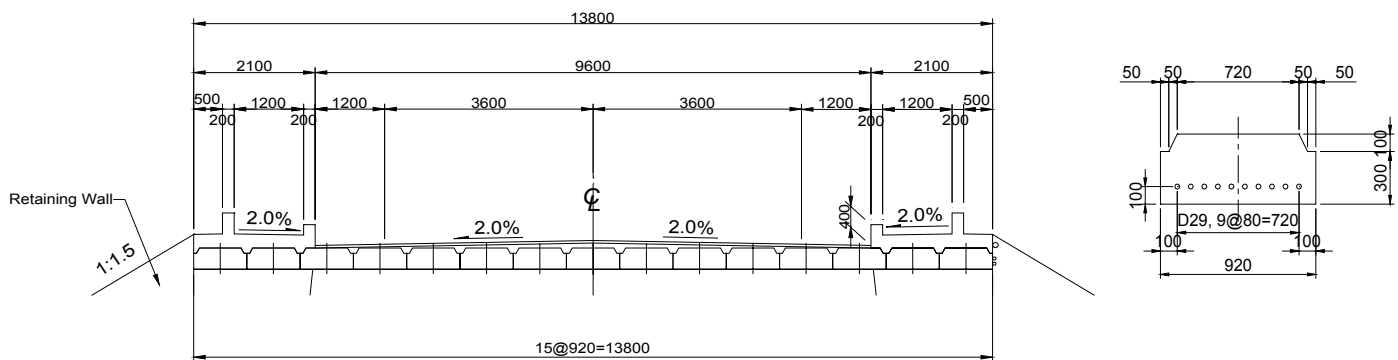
Arrangement & Typical Cross Section of New Precast RC Slabs for Malakal Causeway
